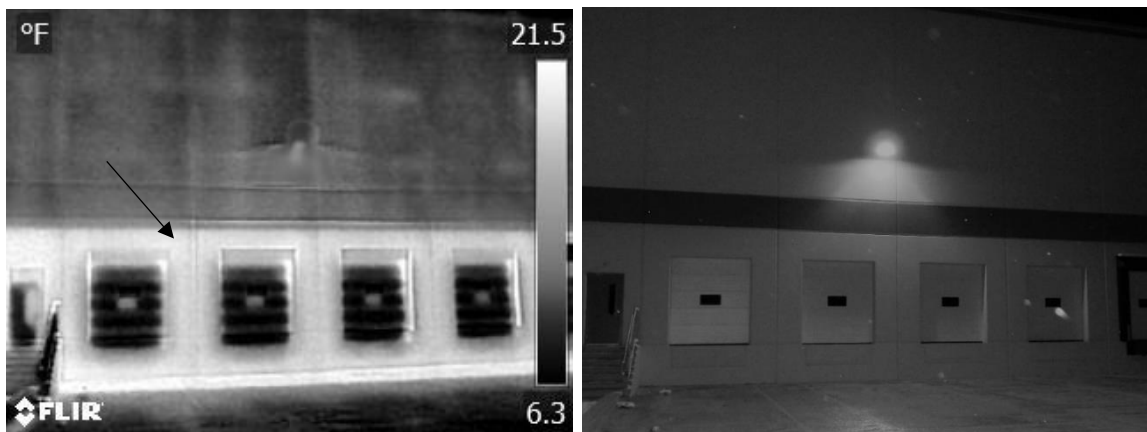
SWP with thermal bridging at solid sections around loading dock: thermal image (left) and visual image (right)
